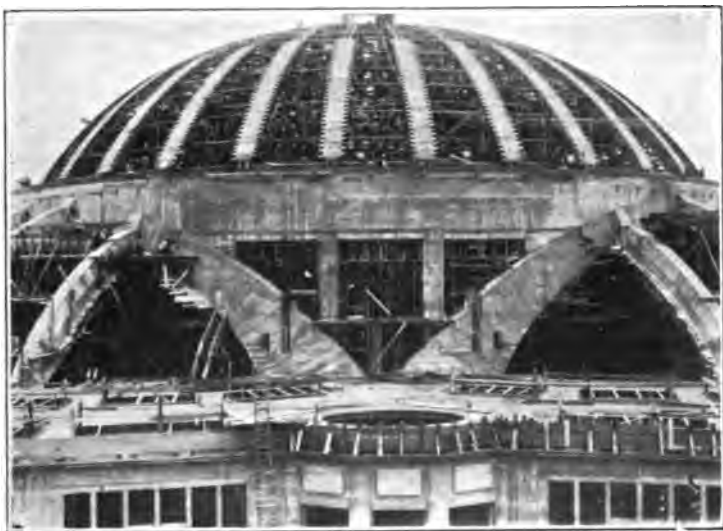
SUBSTRUCTURE AND CENTERING FOR HALF-RIBS OF DOME.
